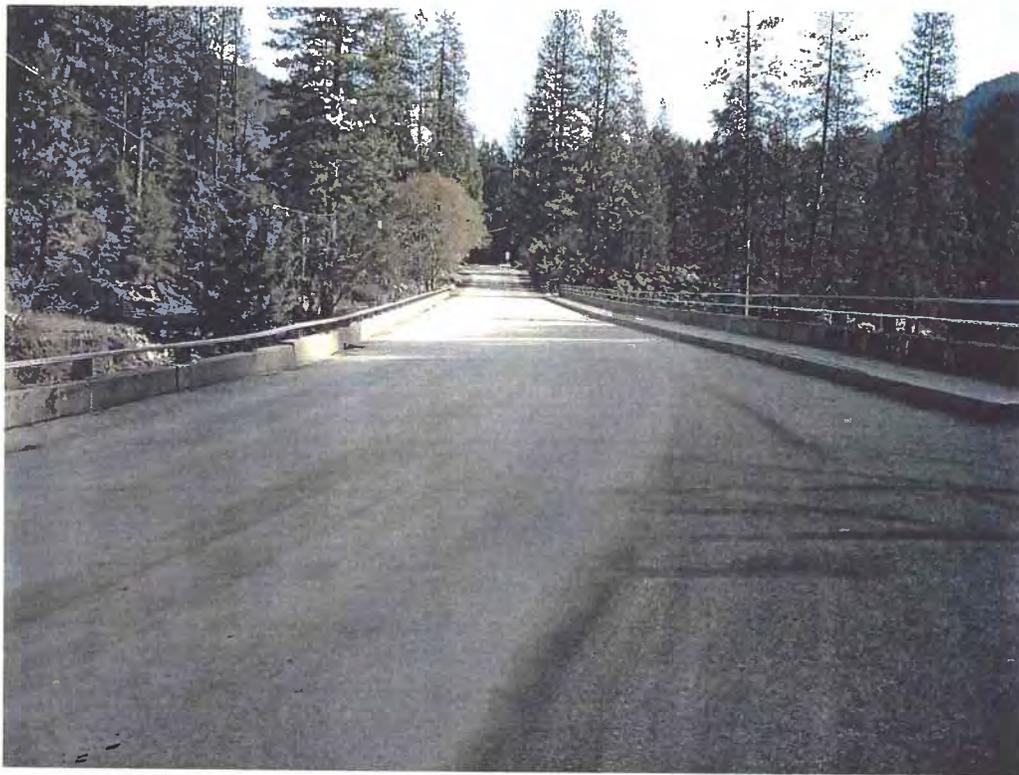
MP 5.38 – The town of Washington, California, looking southwest.
